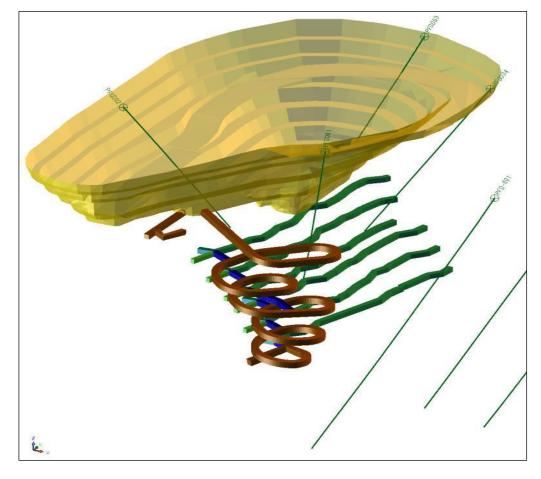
Penny's Find Open Pit and Underground Design (Looking northwest)
